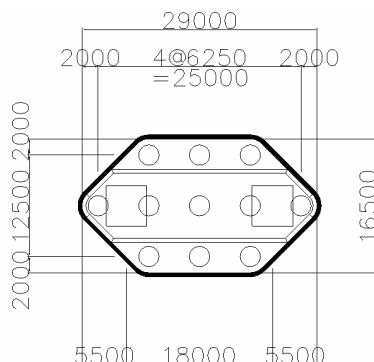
Arrangement of Pile for Multi Column Foundation
